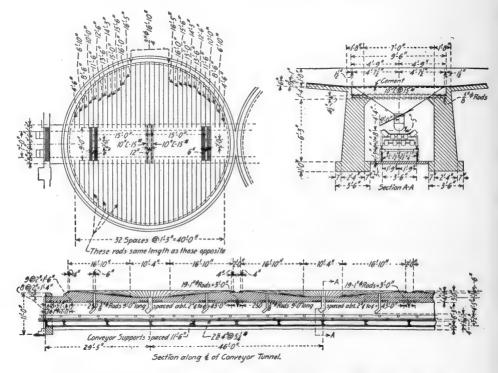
Decails of Bin Bottoms and Conveyors under Bins, Independent Elevator.
